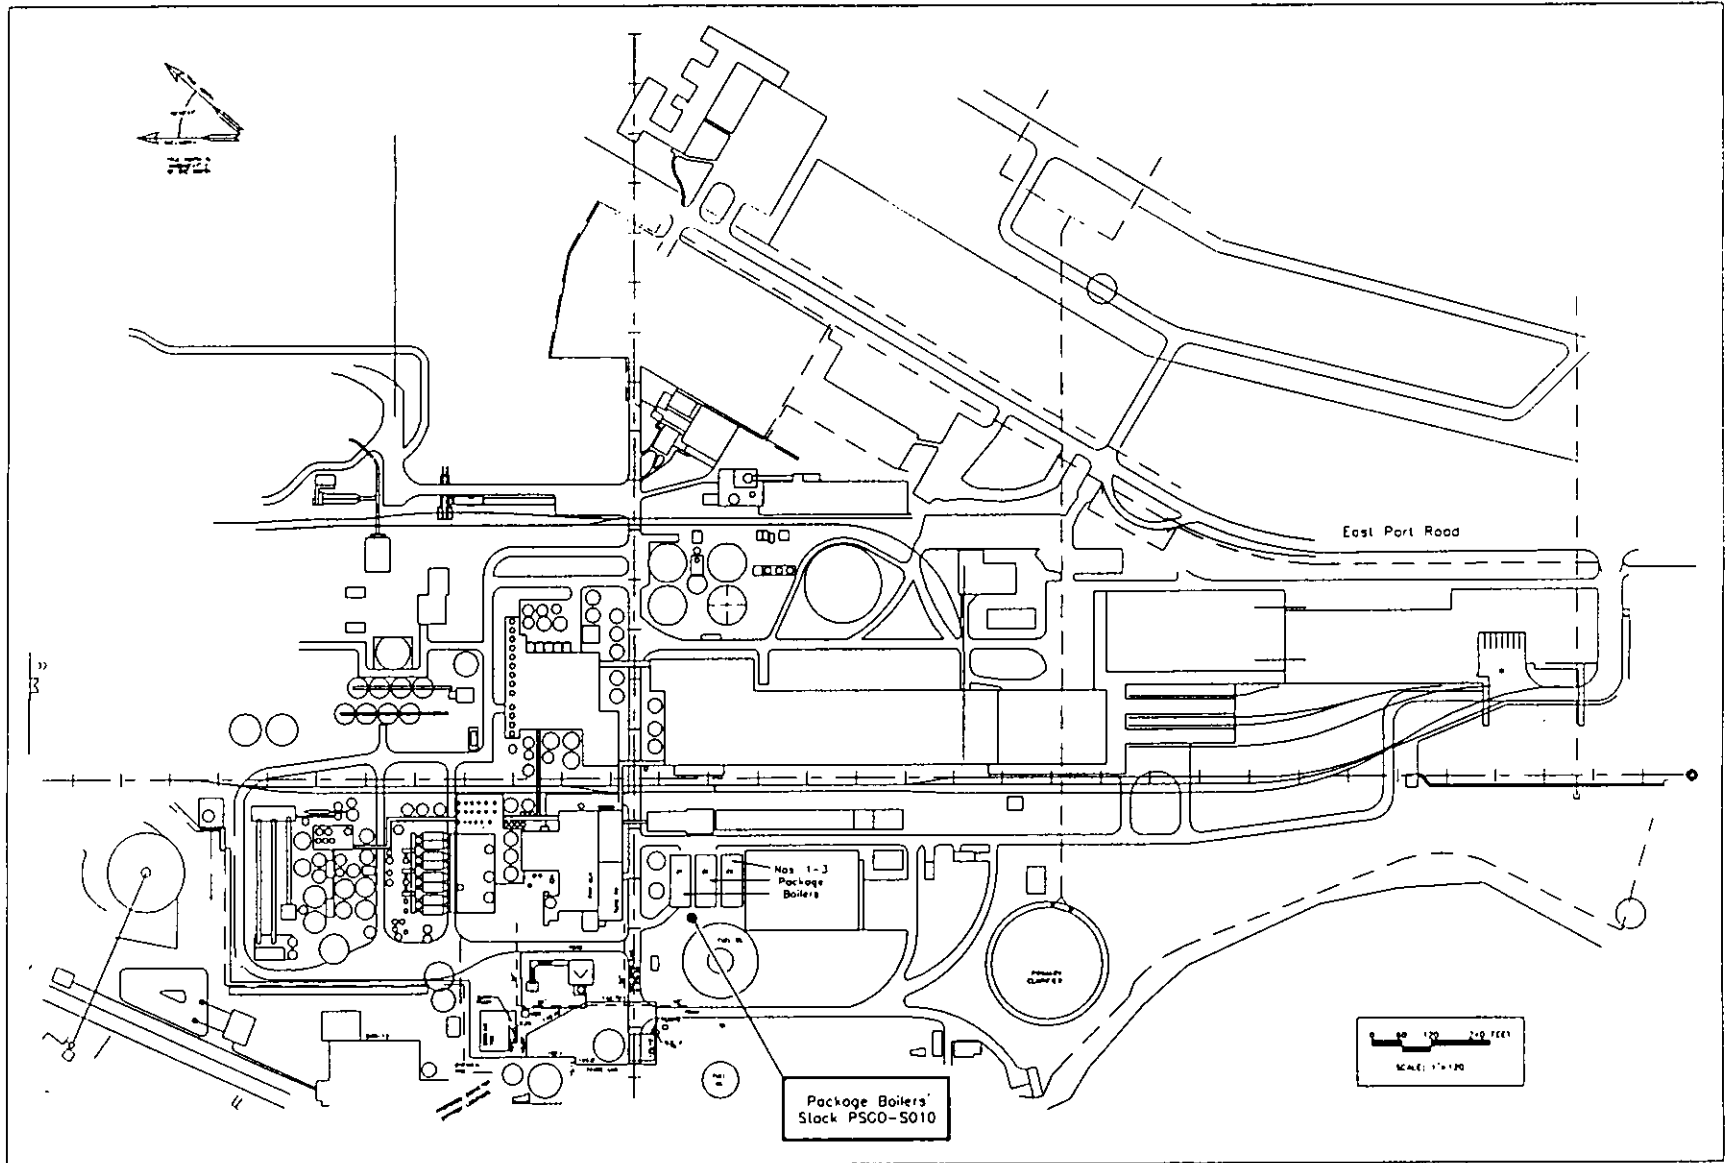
Plot Plan of Stone Container Corporation Facility
